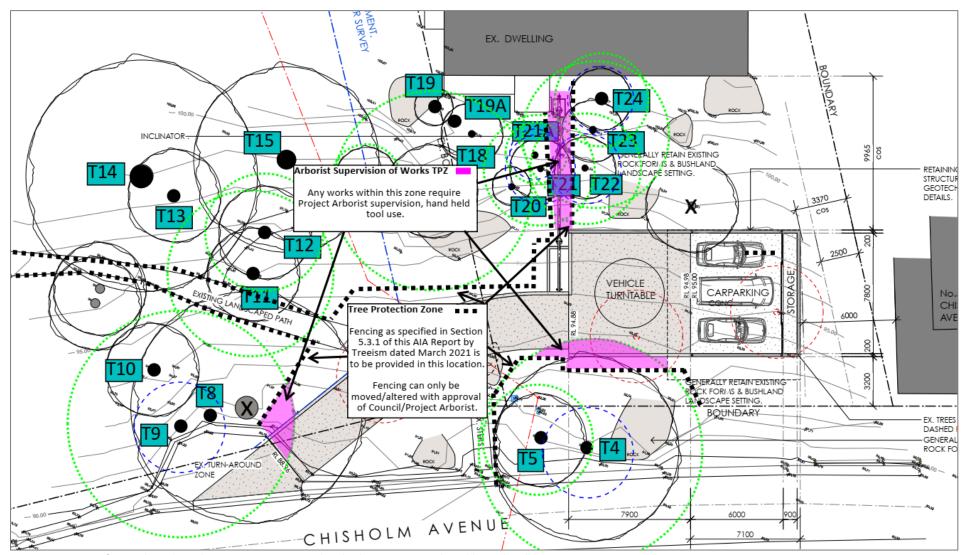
Excerpt of Carparking Floor Plan, Drawing no. SK-02, dated February 2021, authored by Andy Lehman Design. Marked up by C Hughes 29/3/21 (NOT TO SCALE).
